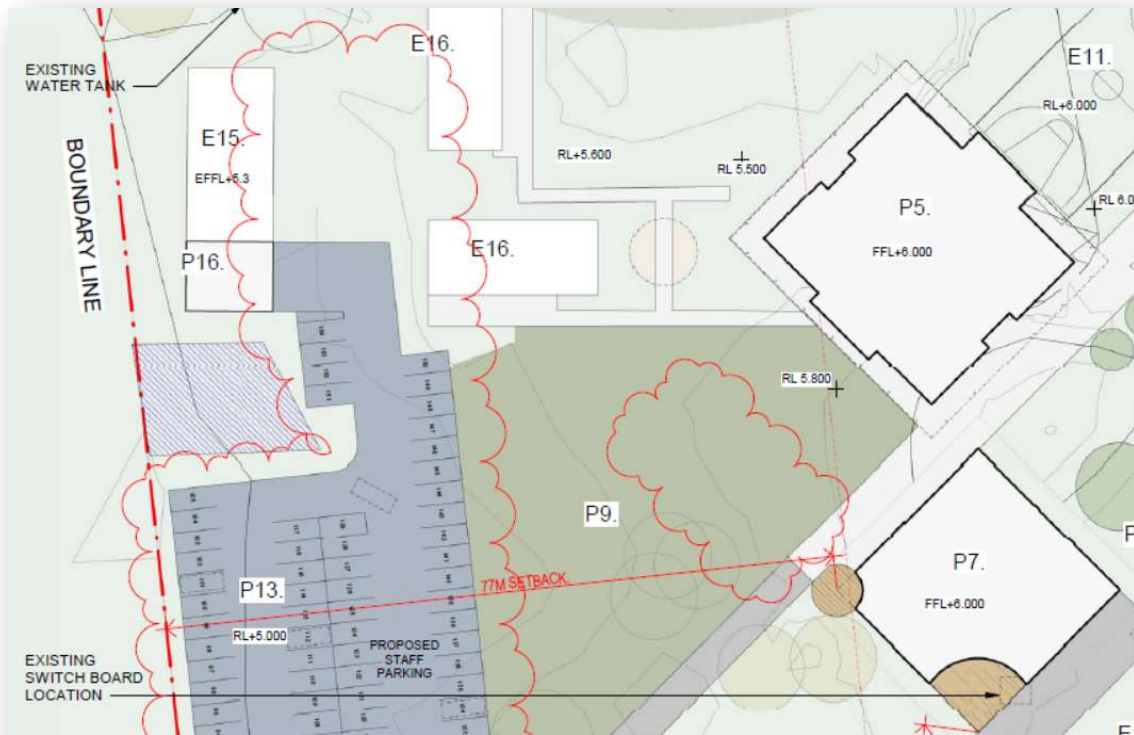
Extract from Front of Campus Site Plan (Drawing DA-11-21) showing the proposed waste enclosure (P16) in the centre left of the image (Source: Cox Architecture 2023)
